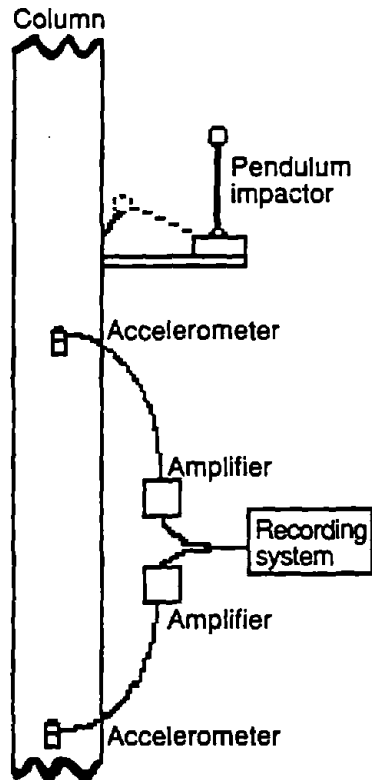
Instrumentation utilized to test wood members in water cooling tower.
